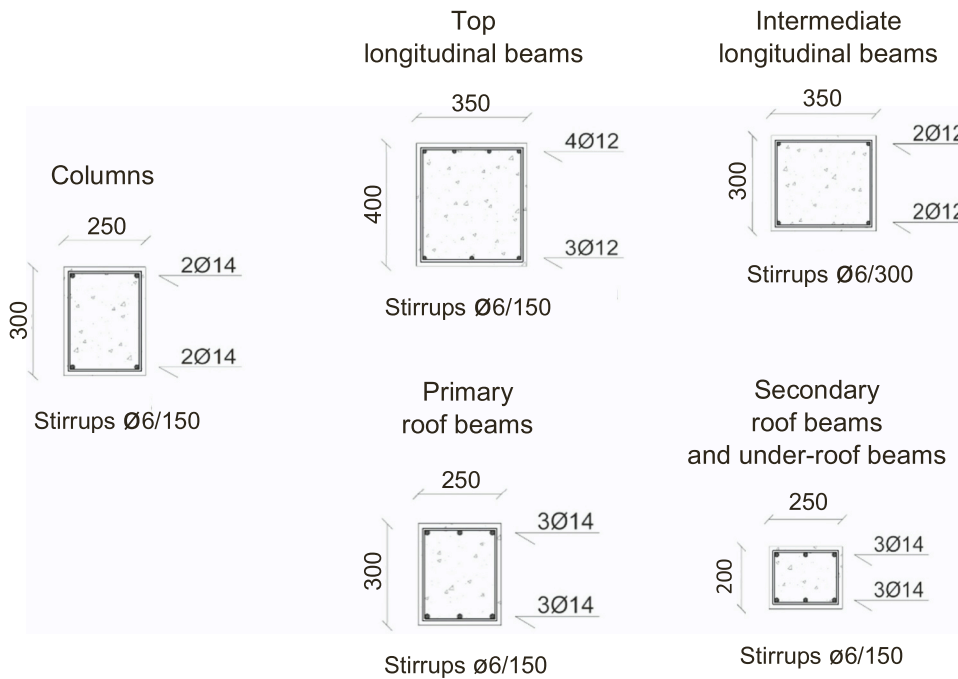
Column and beam cross sections (dimensions in millimeters).
